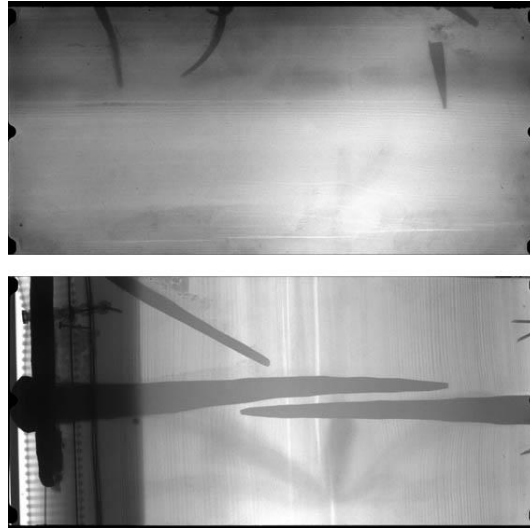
Radiograph X.15 modified showing detail of primary beam at wall support (Top) and radiograph X.23 modified showing nails at beam-column connection (Bottom).
